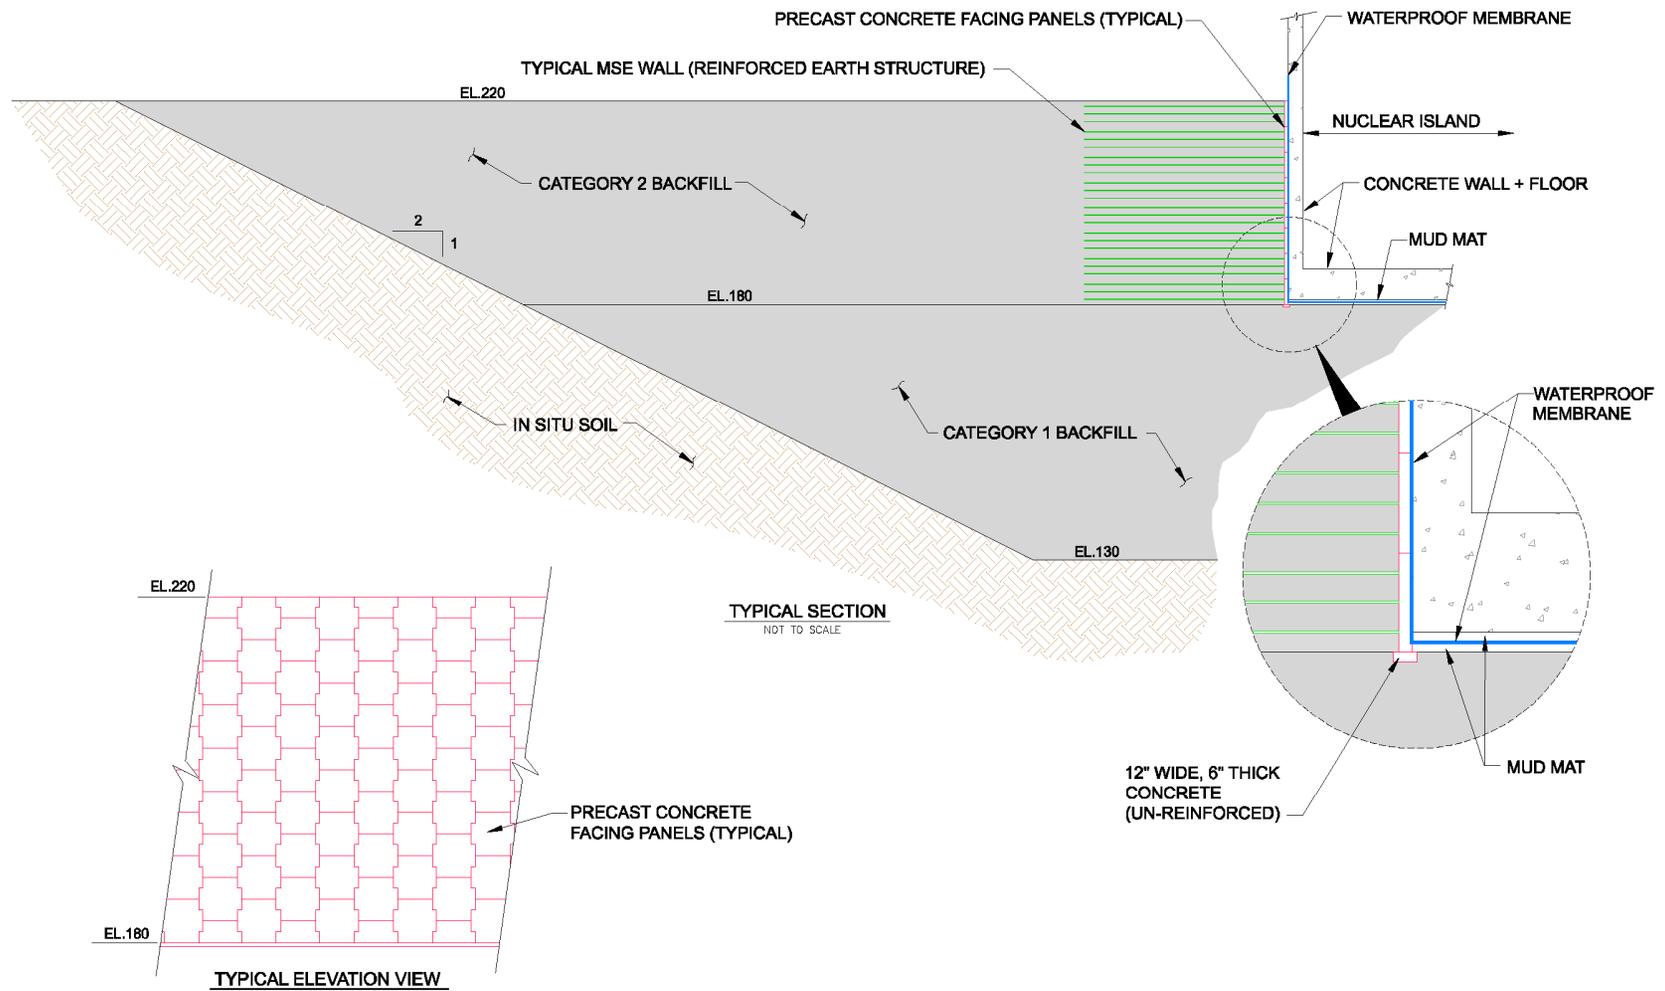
Nuclear Island Temporary Retaining Wall
